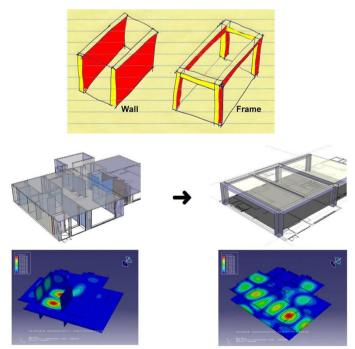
Characterisitcs for Floor Impact Noise of Wall and Frame Structure
